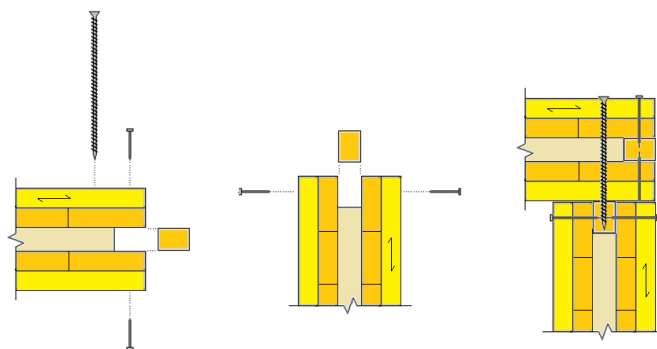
Screws, nails and splines solution for corner wall-to-wall or floor-to-wall connections.
